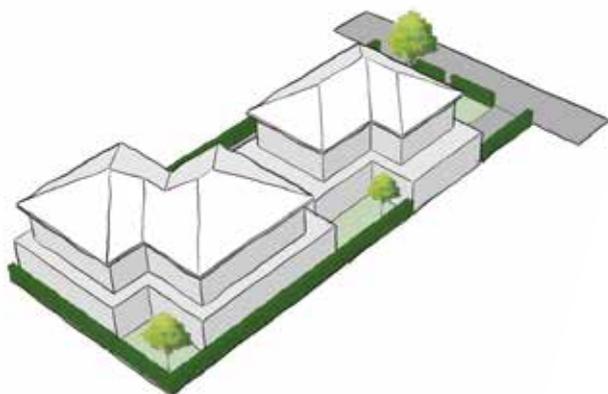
Typical dual occupancy constructed without the new 35% minimum garden area requirement.
